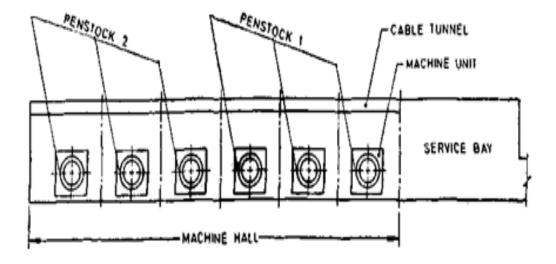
B LAYOUT OF COMPOSITE ARRANGEMENT POWER STATION
